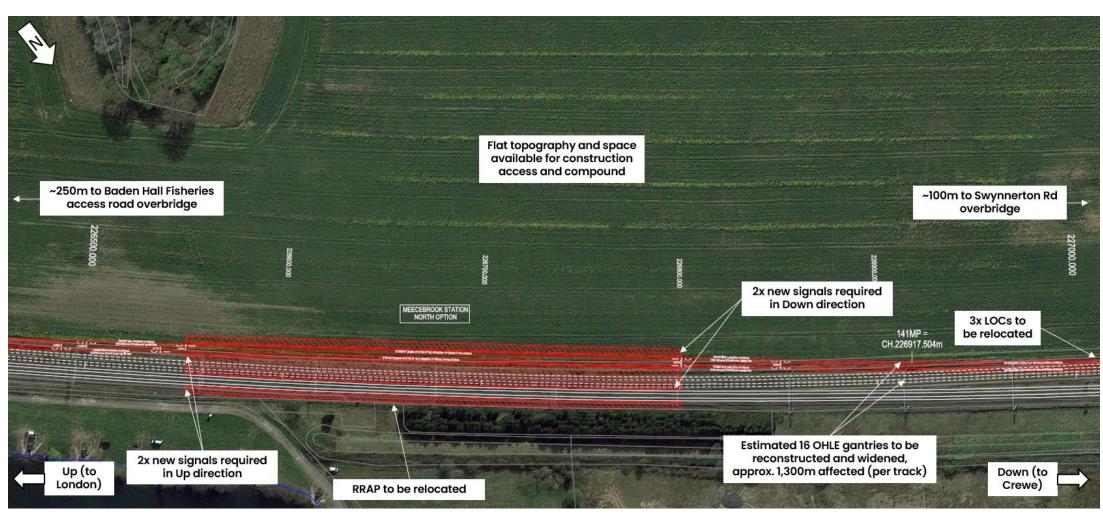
North Option impact assessment (see Section 5 and Appendix A for detail)
